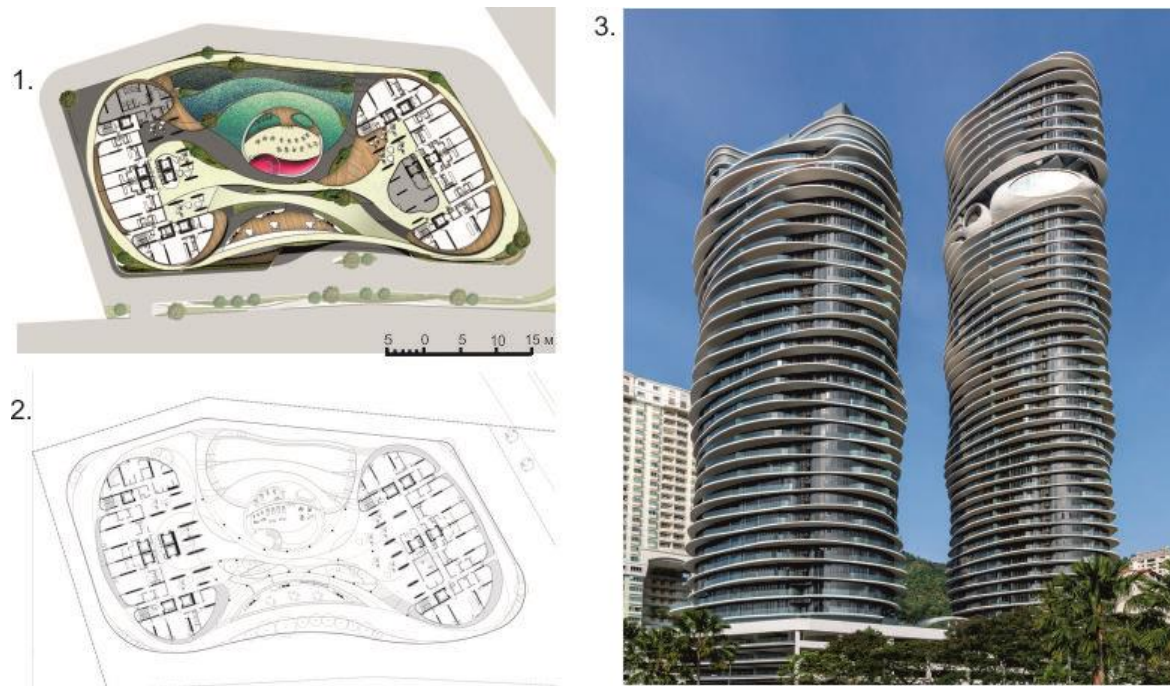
Large residential complex. Complex in Air-Tam, Penang, Indonesia, studio SPARK Architects (2018): 1. Deck floor plan. 2. First floor plan. 3. General view [17]
